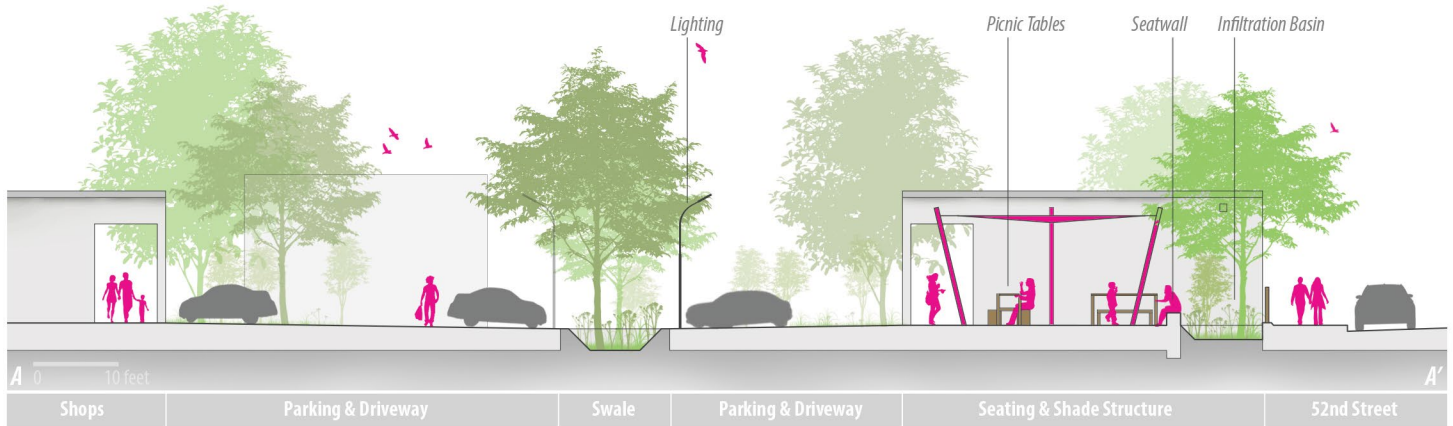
Orange Avenue Commercial Area - Concept Plan & Section
